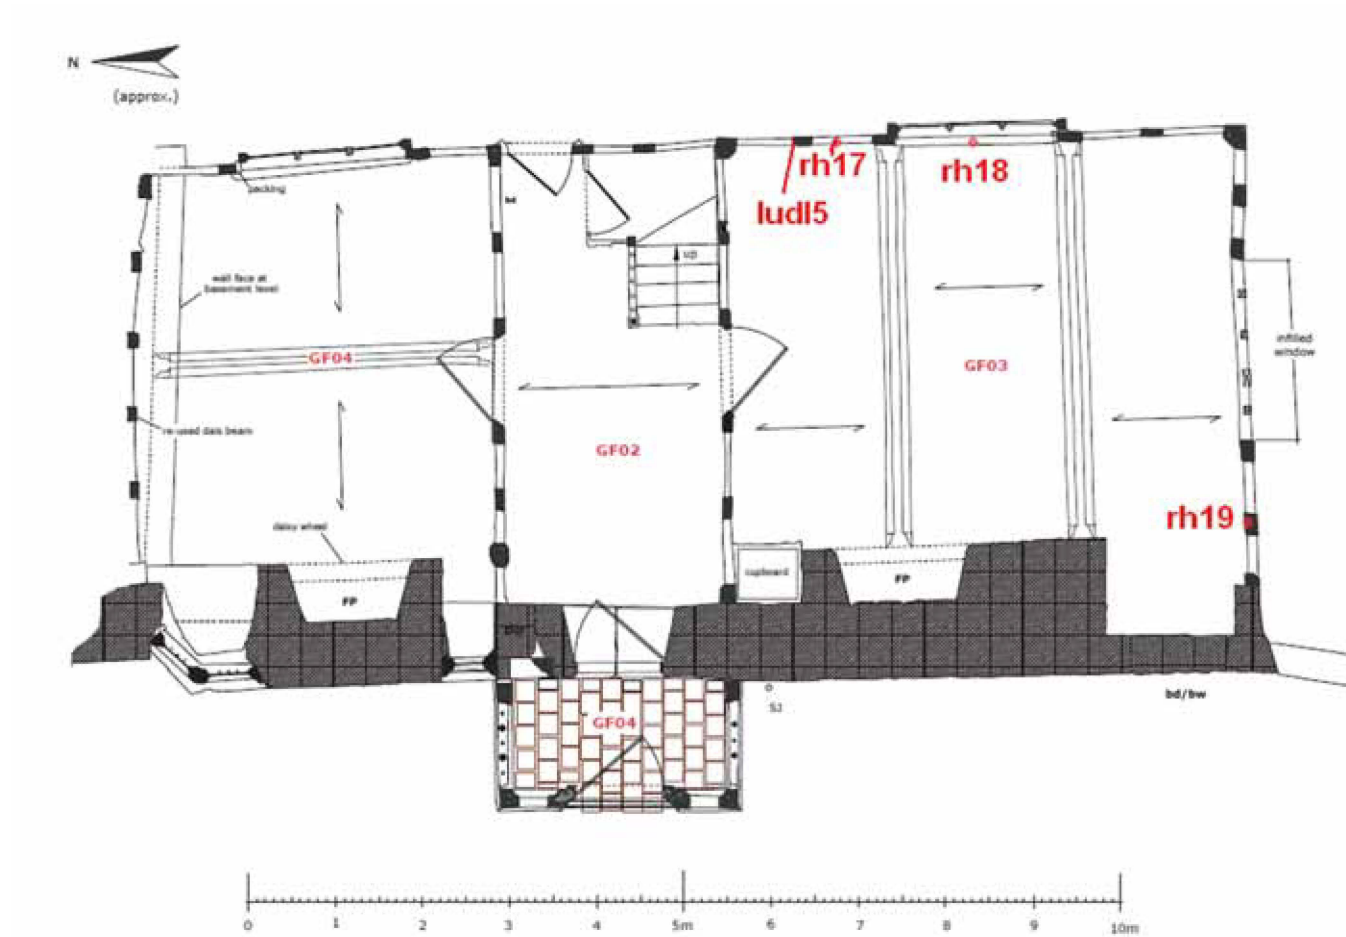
Ground-floor plan, showing timbers sampled for dendrochronology (after Tyler)
